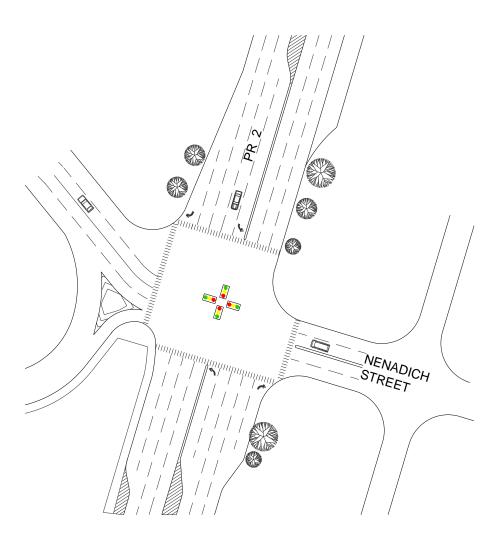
A: Plan view of the intersection PR2 and Nenadich Street
